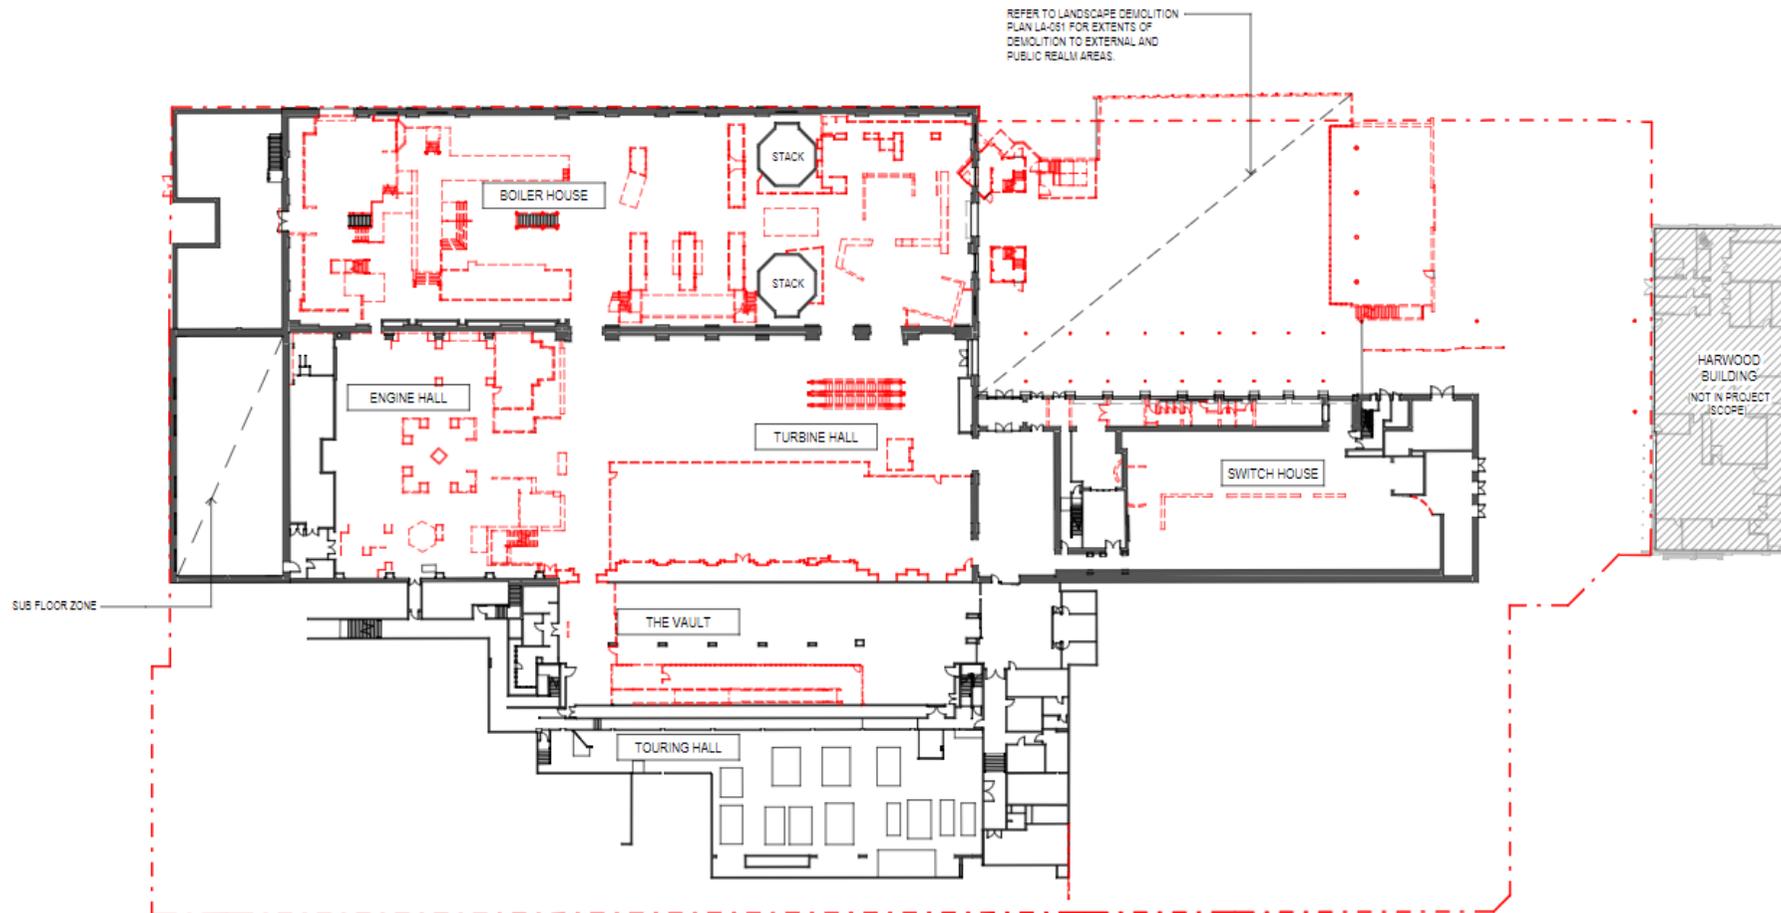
Ultimo Powerhouse- Reference Design Demolition Level L01 Plan (Source: John Wardle Architects 2022)
